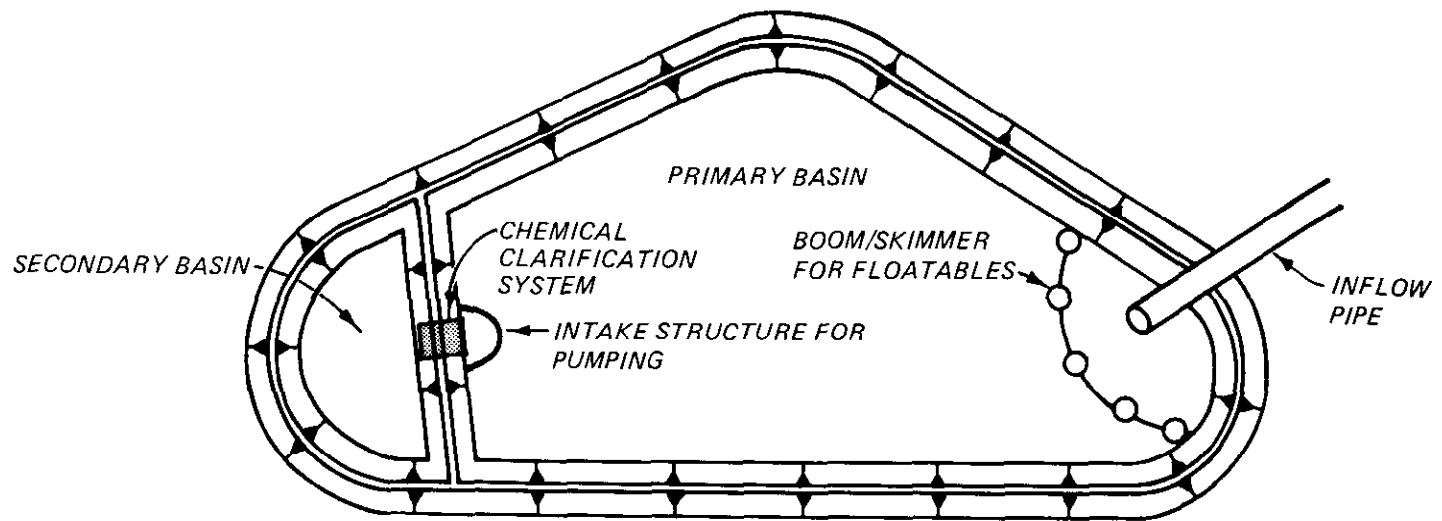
Plan view of confined disposal facility showing arrangement of contaminant control features
